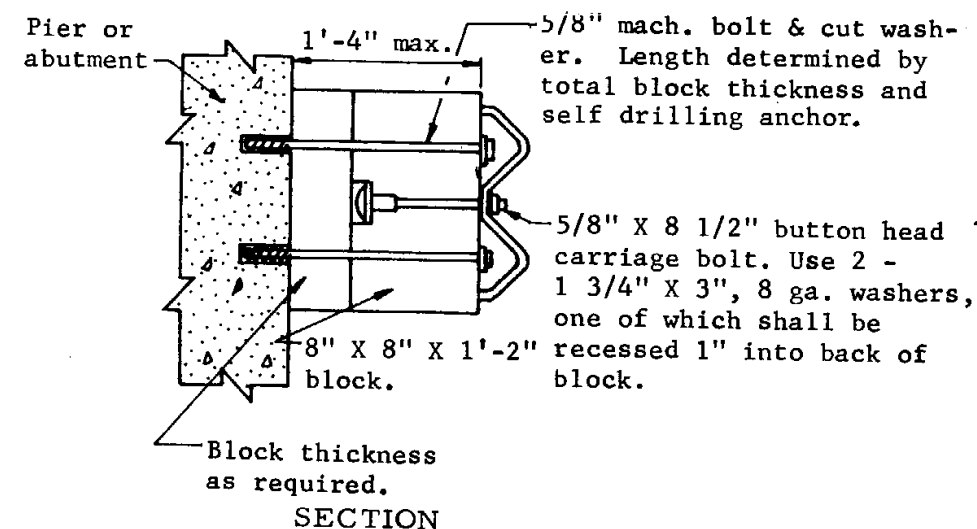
GUARD RAIL POST INSTALLATION ON STRUCTURES
